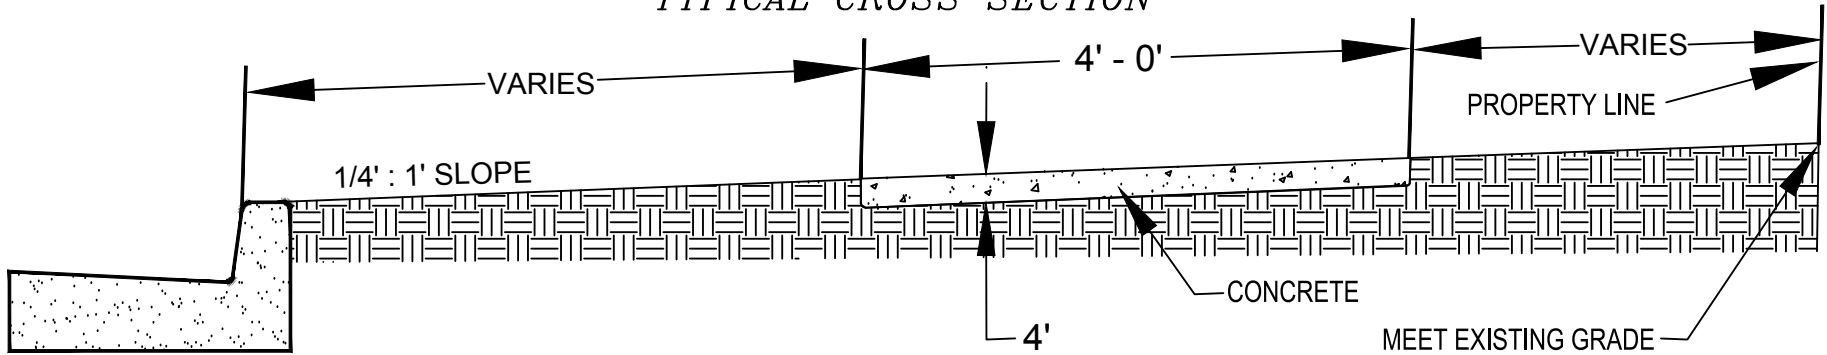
DETAIL OF CONCRETE SIDEWALK TYPICAL CROSS SECTION
